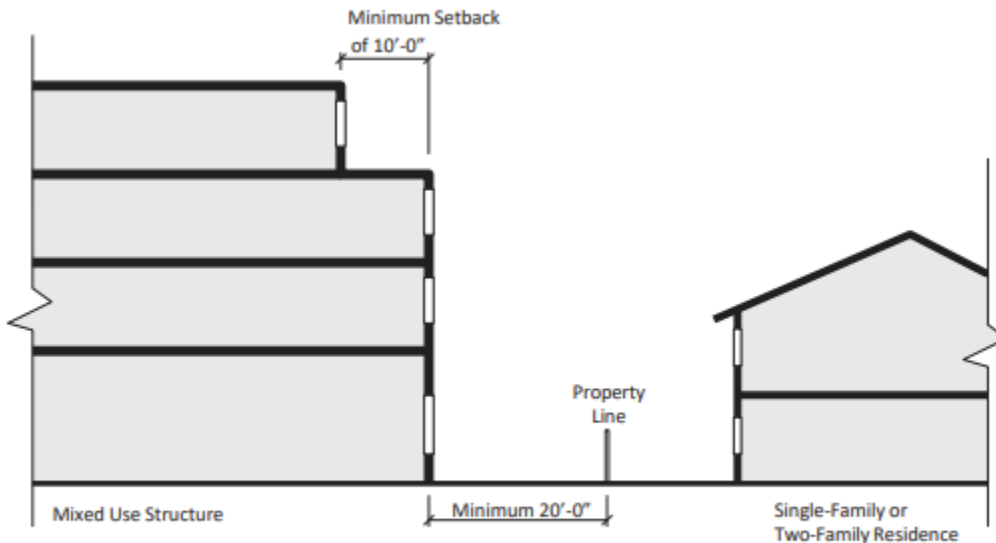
A: Building height step back adjacent to residential zone or use
